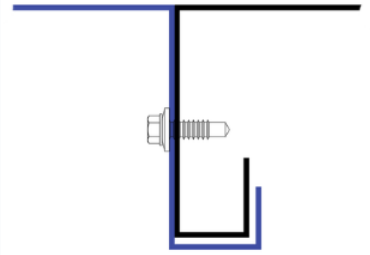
DETAIL · FASTENED WITH RIB STIFFENER
